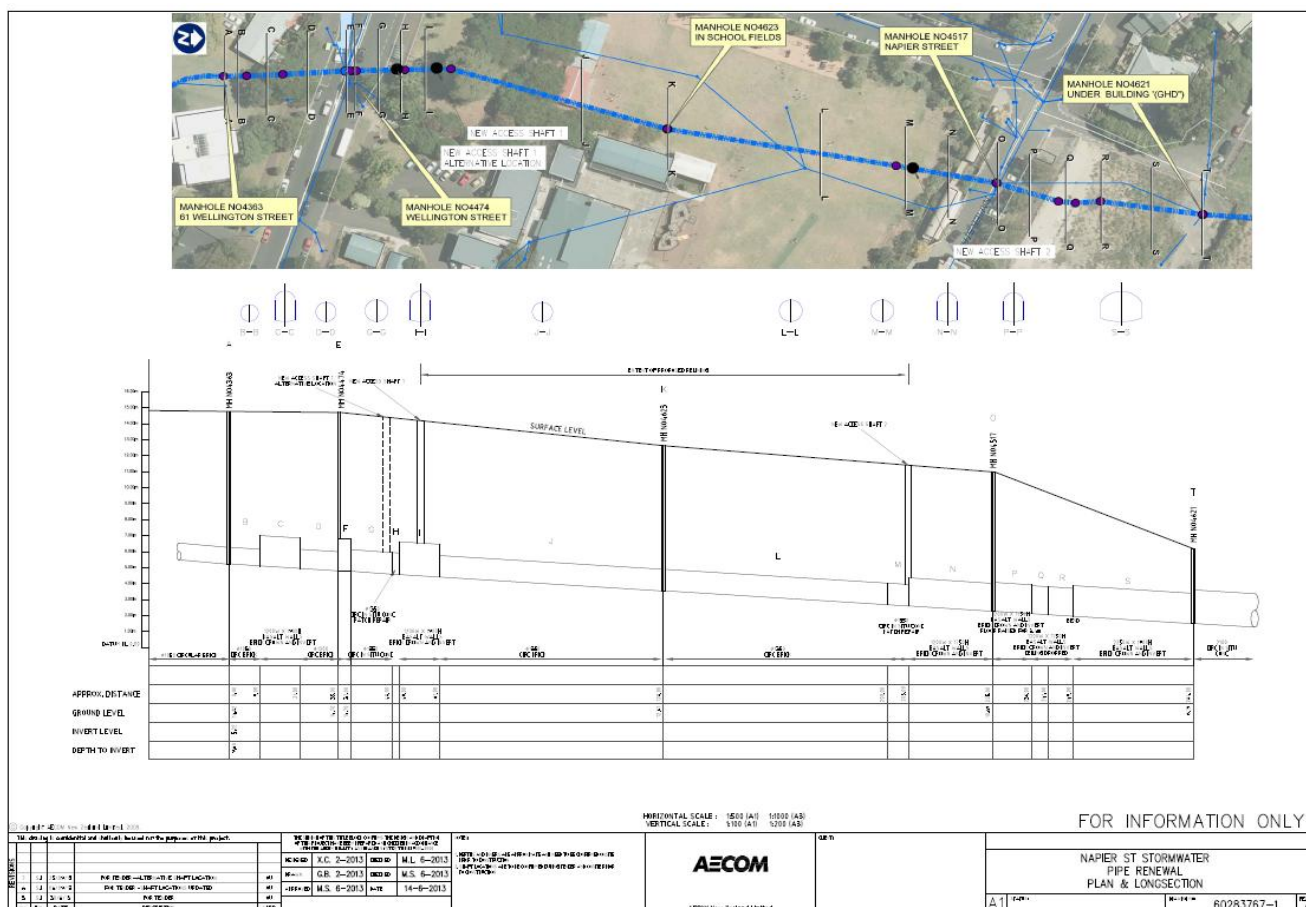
Napier St Stormwater Culvert Rehabilitation – Plan and Long Section
